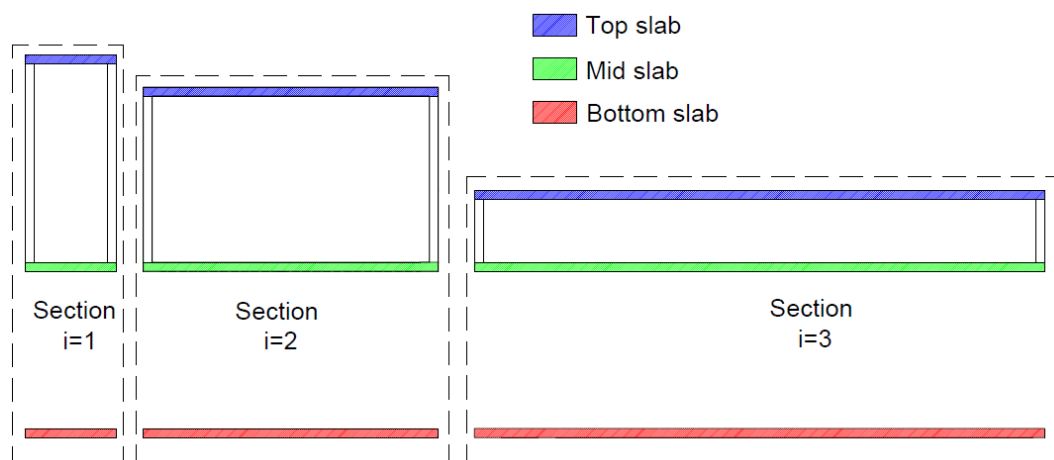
OVERVIEW SLABS WITHIN CROSS-SECTION
